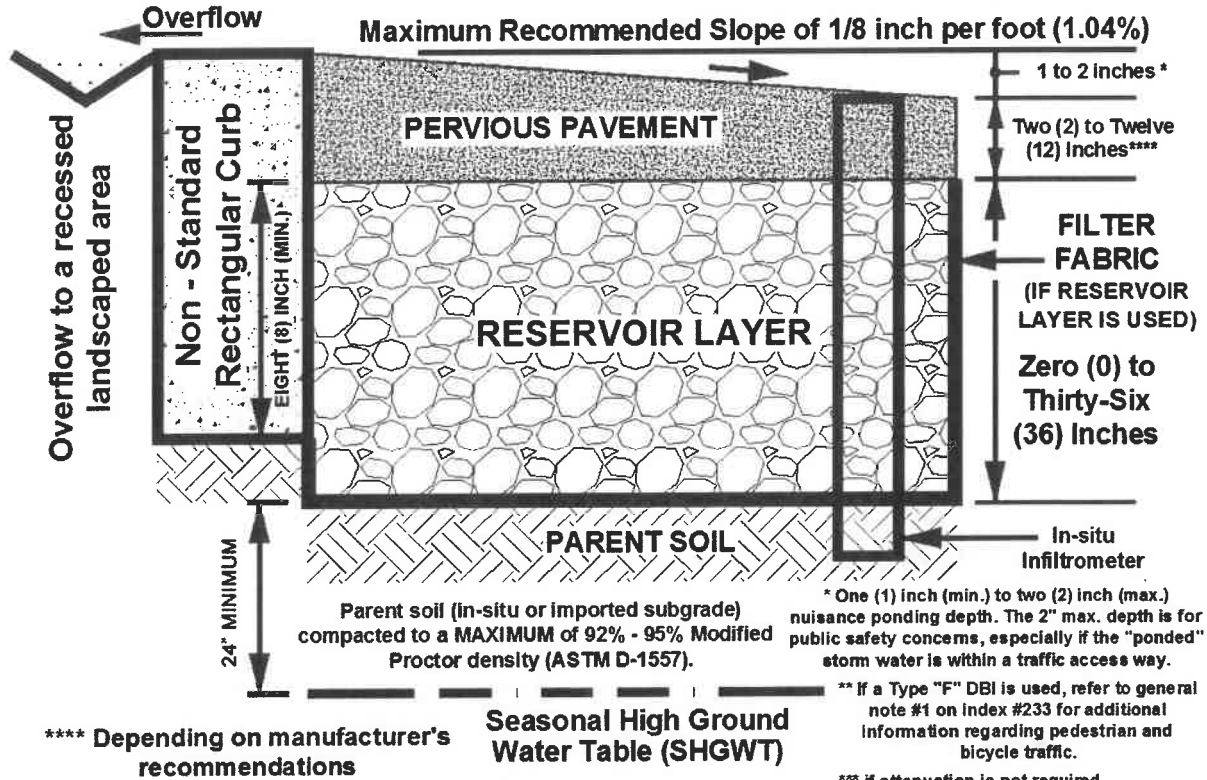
Pervious Pavement System Cross Section #1.
